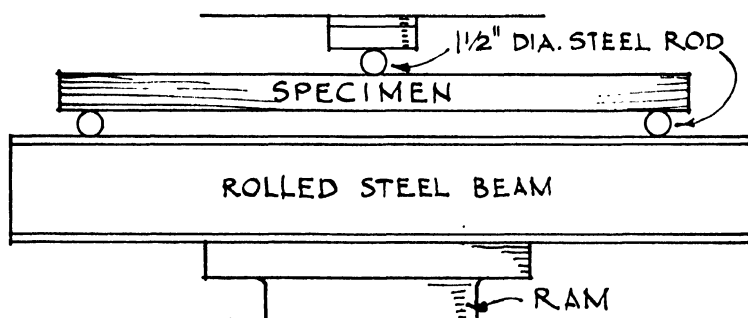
Transverse Testing in a Compression Testing Machine.
